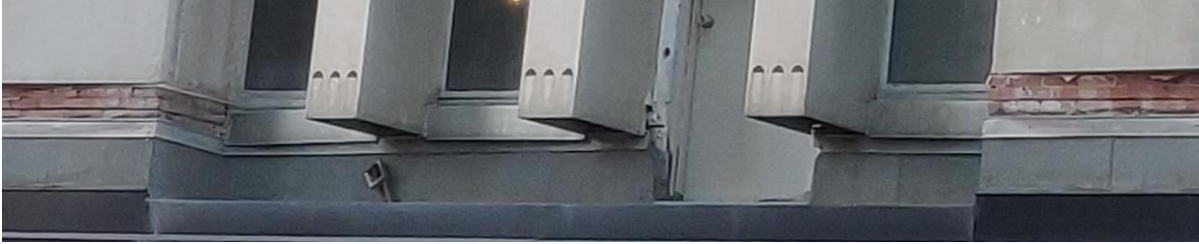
Stylized aluminum-clad pilasters on central frontispiece with scalloped aluminum cladding details at spandrel panels from storeys two through ten)
